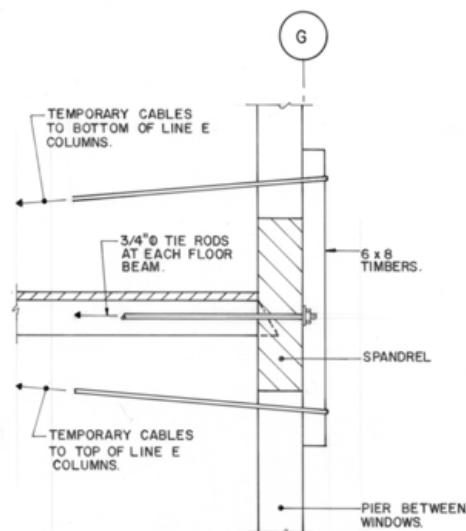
Shoring scheme showing inclined shores and tie rods at the wall on Line G.
